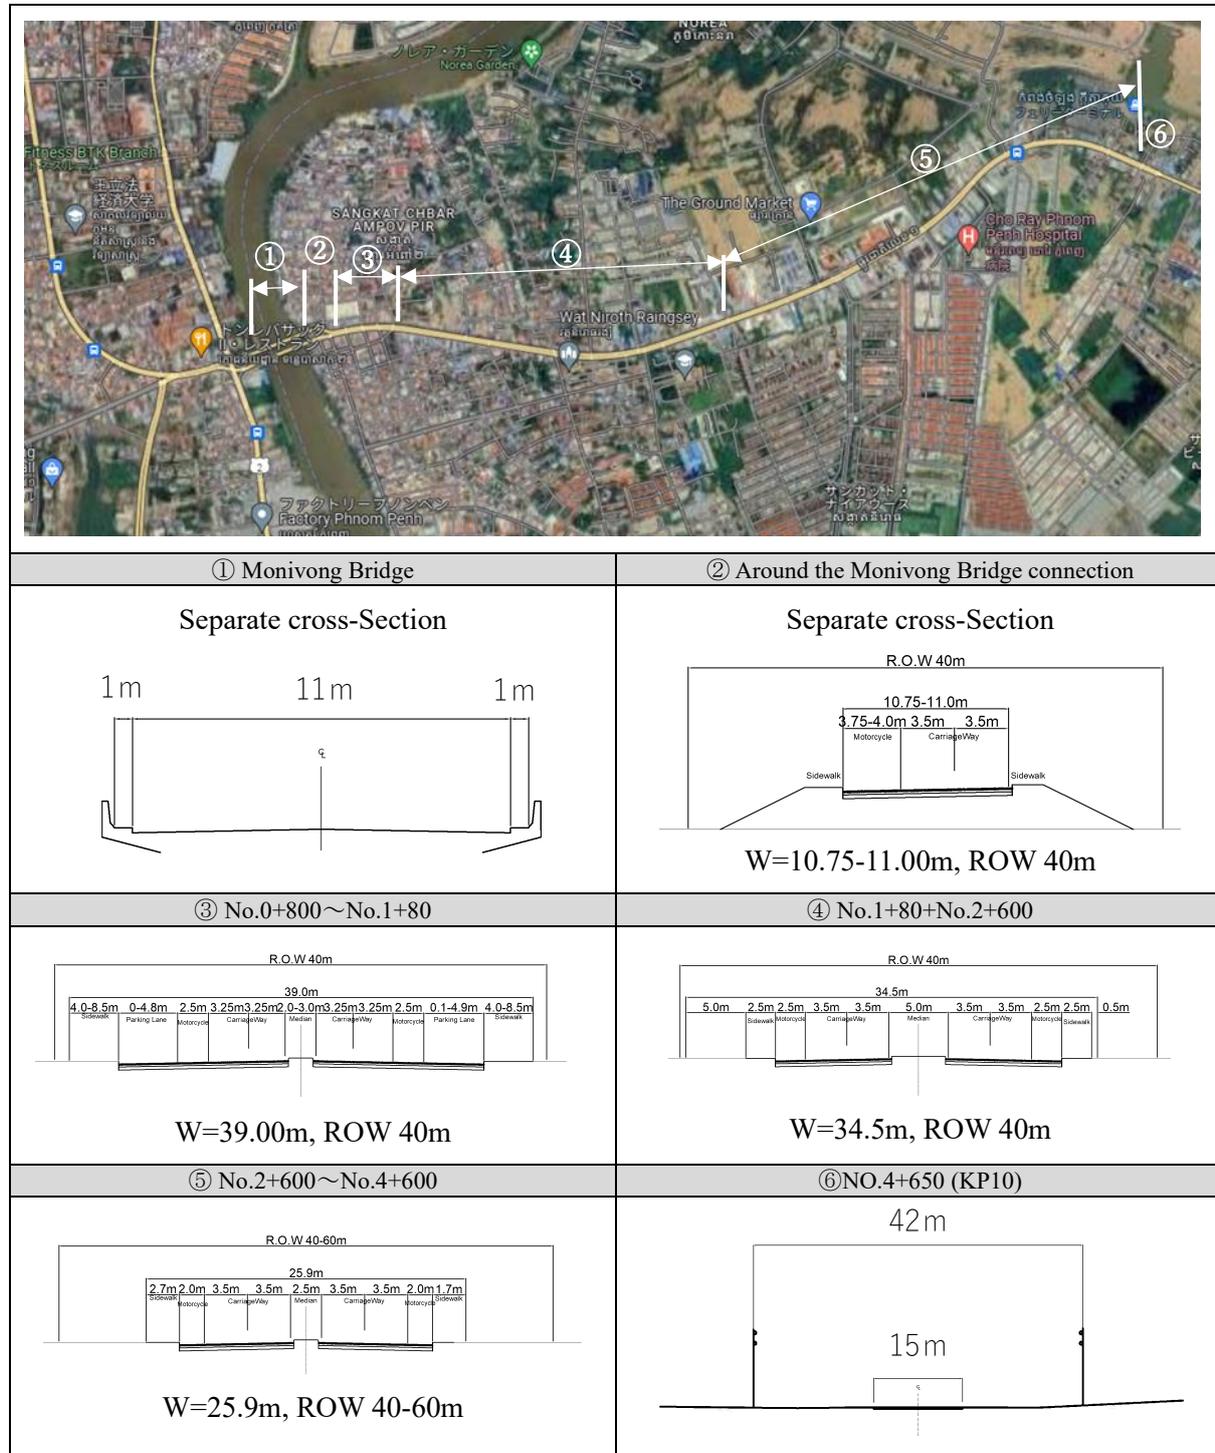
Existing Road Width of NR1 (0-4 km)
